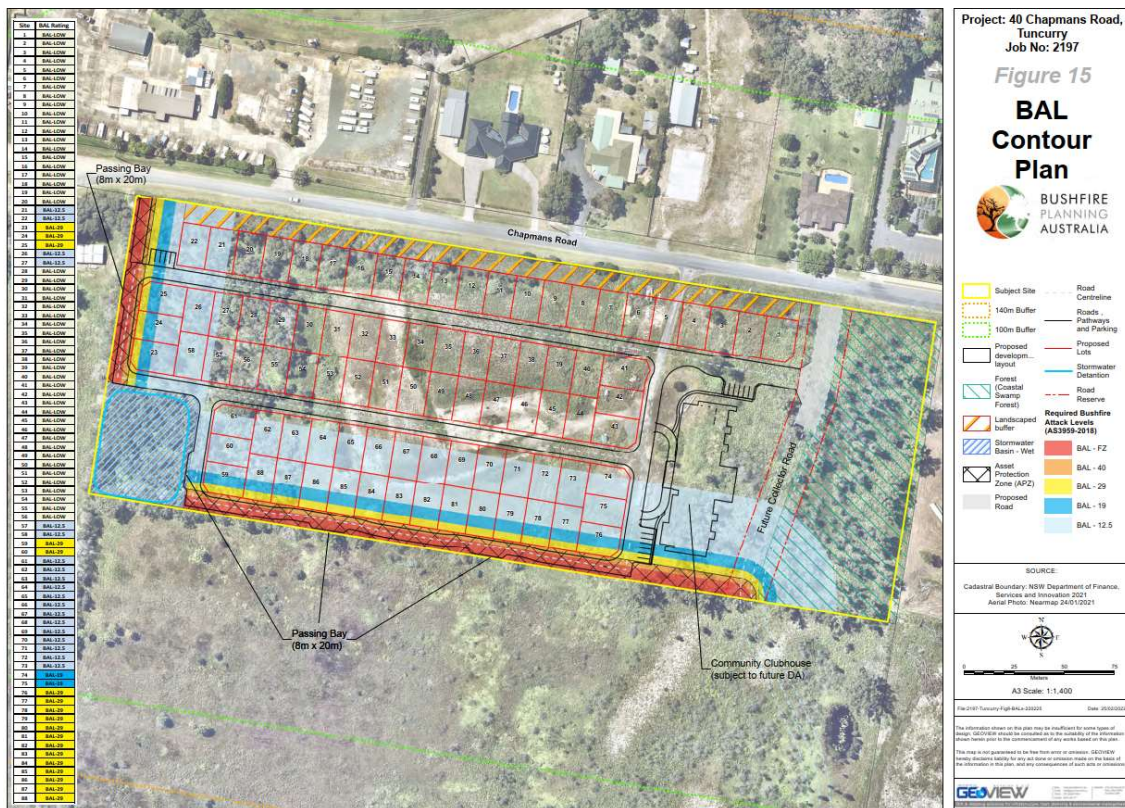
Site Plan with APZ Compliance (source: Bushfire Planning Australia report)
